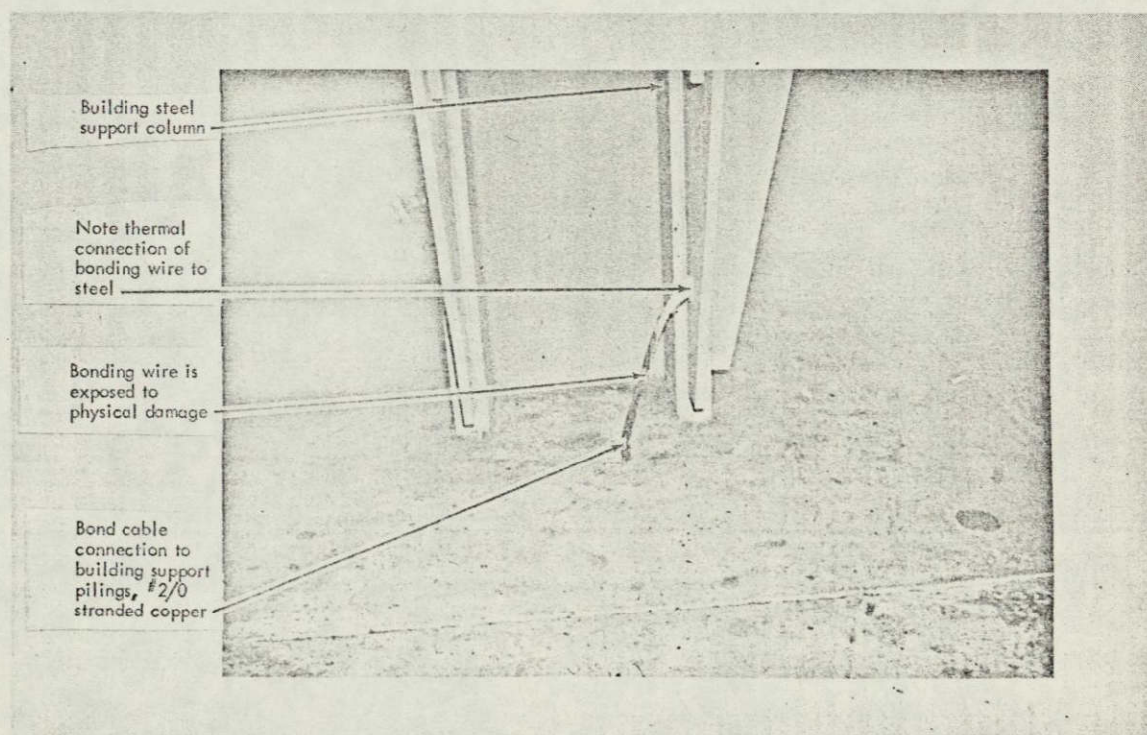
Typical VAB Structural Steel Ground. 2/0 AWG cables connect to Earth Grounding Counterpoise.
